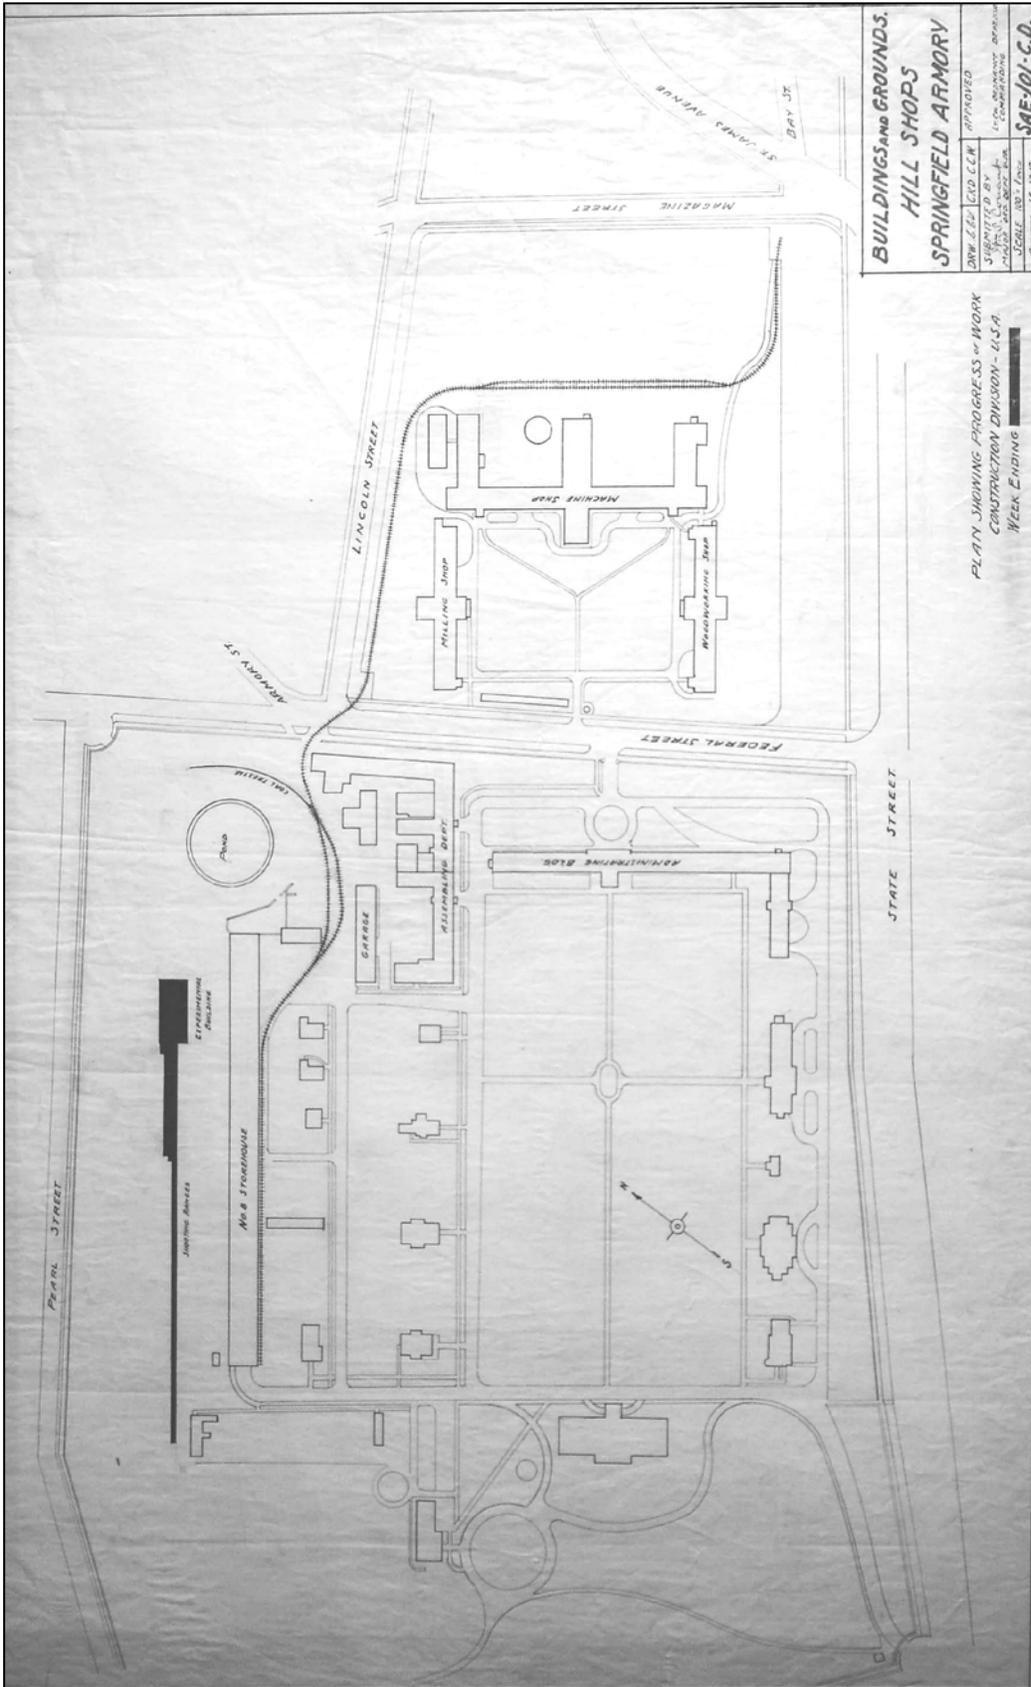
Buildings and Grounds, Hill Shops, Springfield Armory, October 18, 1918. In Armory Square Building 16 and Building 27, formerly workshops, are labeled the Administration Building and the Assembling Department, respectively. The buildings in Federal Square are labeled as the Milling Shop, Machine Shop, and Woodworking Shop.
